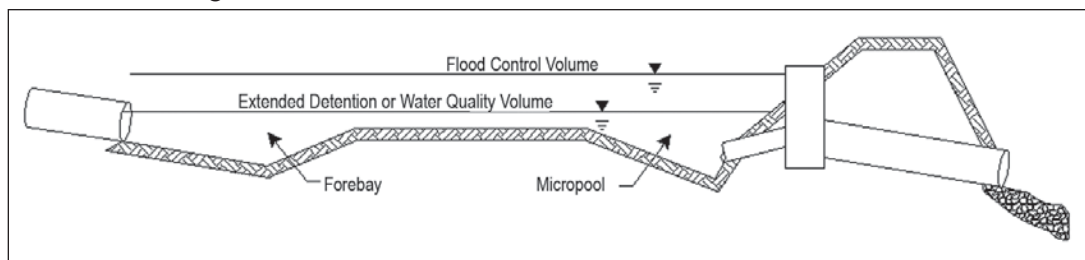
Storm Water Pond with Extended Detention and Flood Control Volumes
